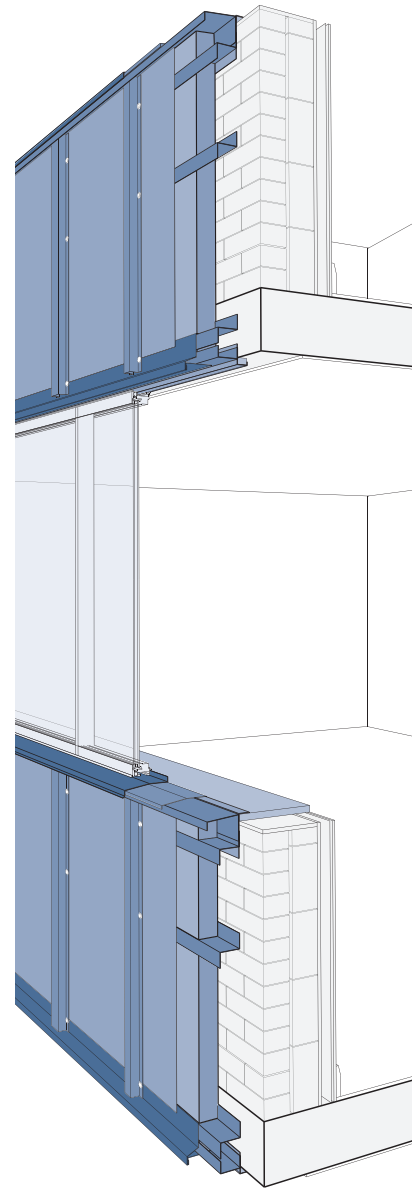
A sheathing paper is applied over the insulation and horizontal z-girts to serve as a drainage plane in the cavity behind the panel cladding. Joints in the sheathing paper should be lapped and taped, ideally located behind the vertical hat channels that are fastened over top.
